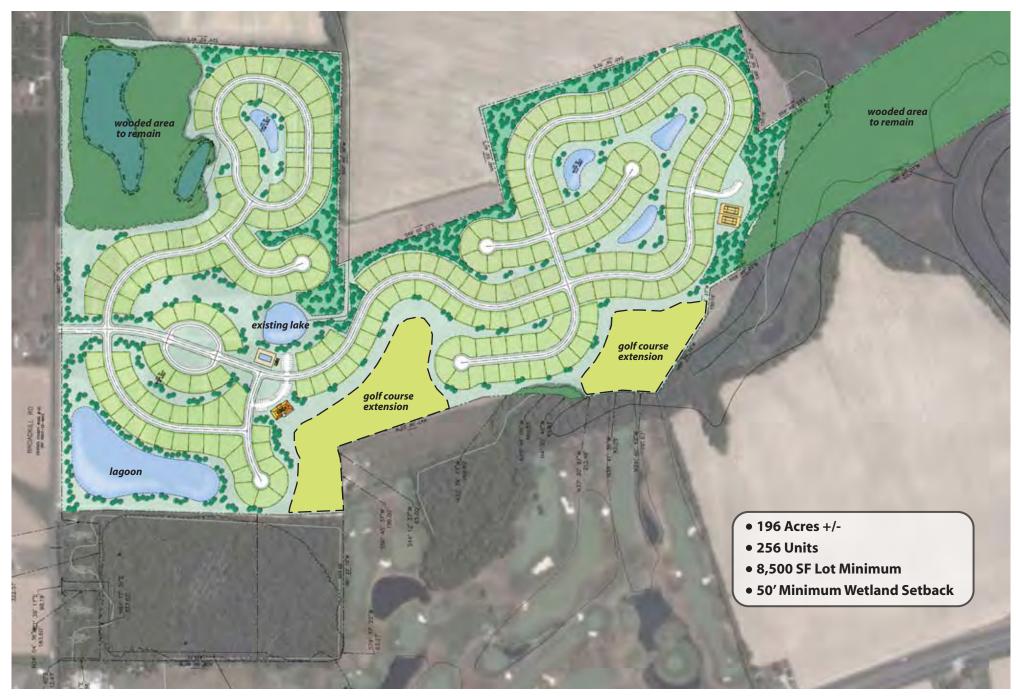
EXHIBIT F: Proposed Plan PLUS REVIEW: 29 JAN 2007
